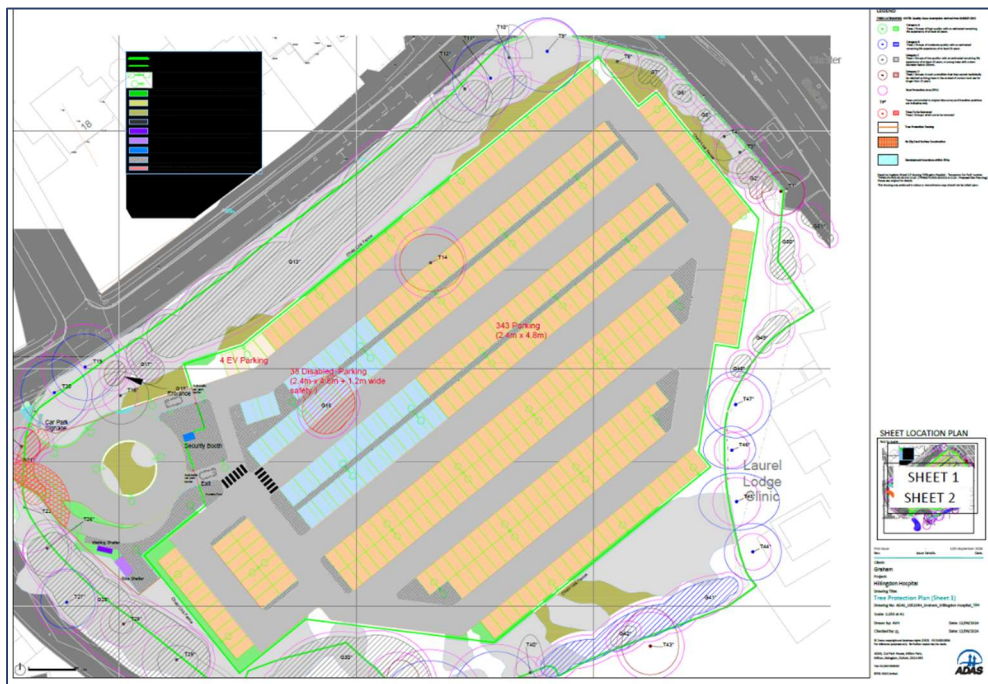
Tree Protection Plan (Sheet 1) showing the location of tree protection fencing and no dig hard surface construction areas
